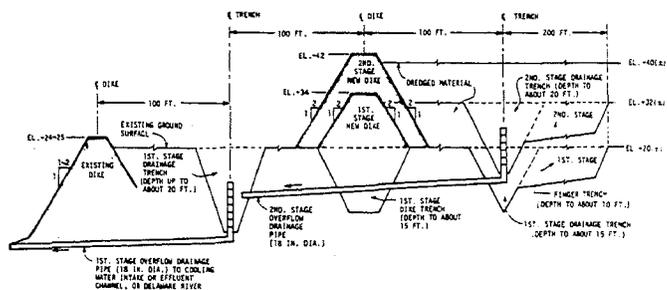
DIKE AND TRENCH CROSS-SECTION
